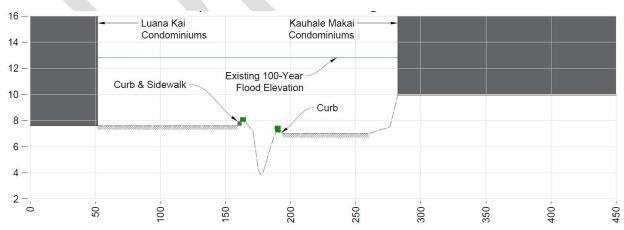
Waipuilani Channel Existing Conditions on Mauka Side of South Kihei Road (Profile Orientation: Left to Right is South to North).
